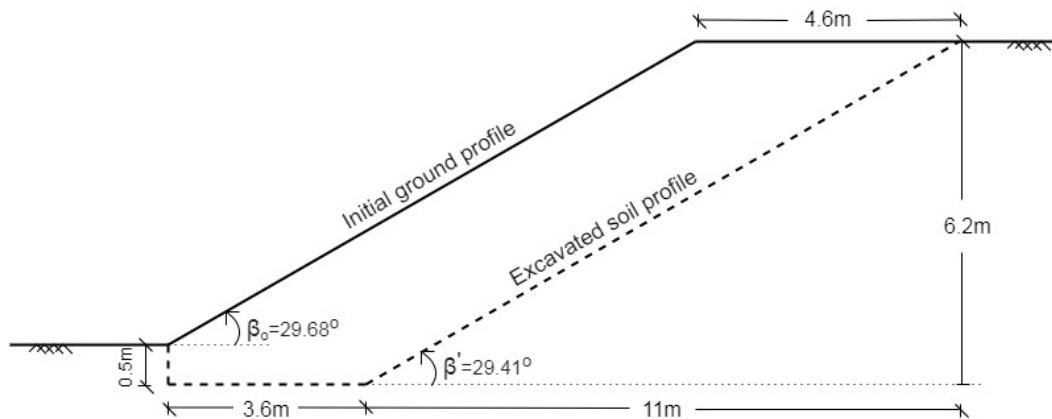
Initial and excavated ground profile for abutment construction as per Table 3.14
